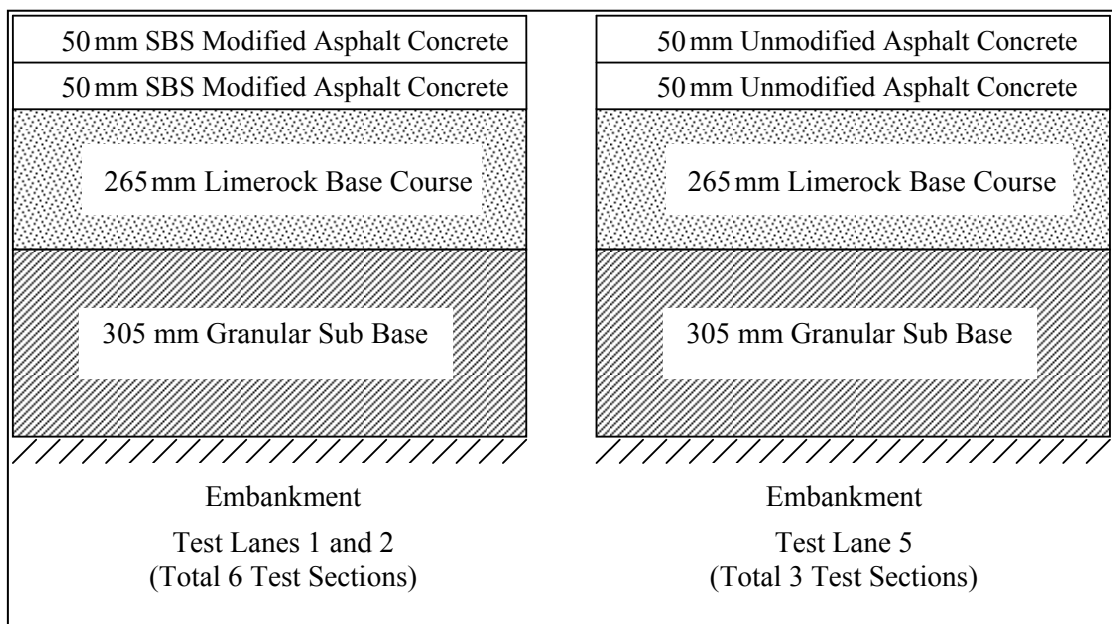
Florida Heavy Vehicle Simulator Pavement Cross Sections
